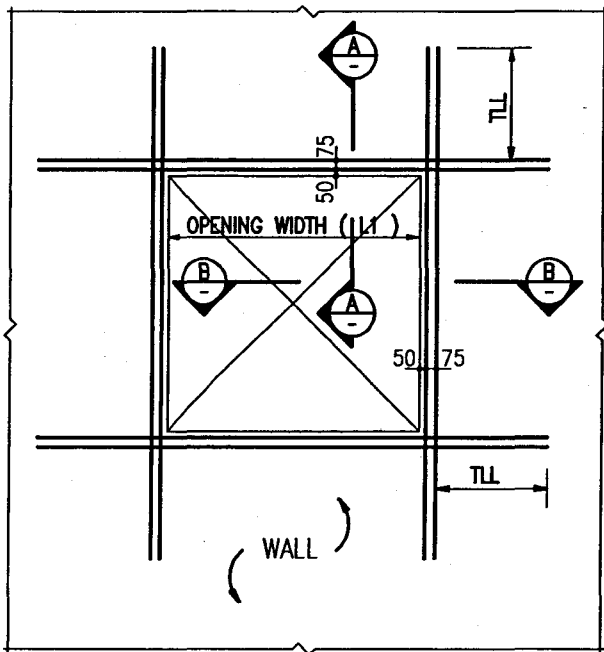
TYPICAL DETAIL OF R.C. STRUCTURAL WALL
